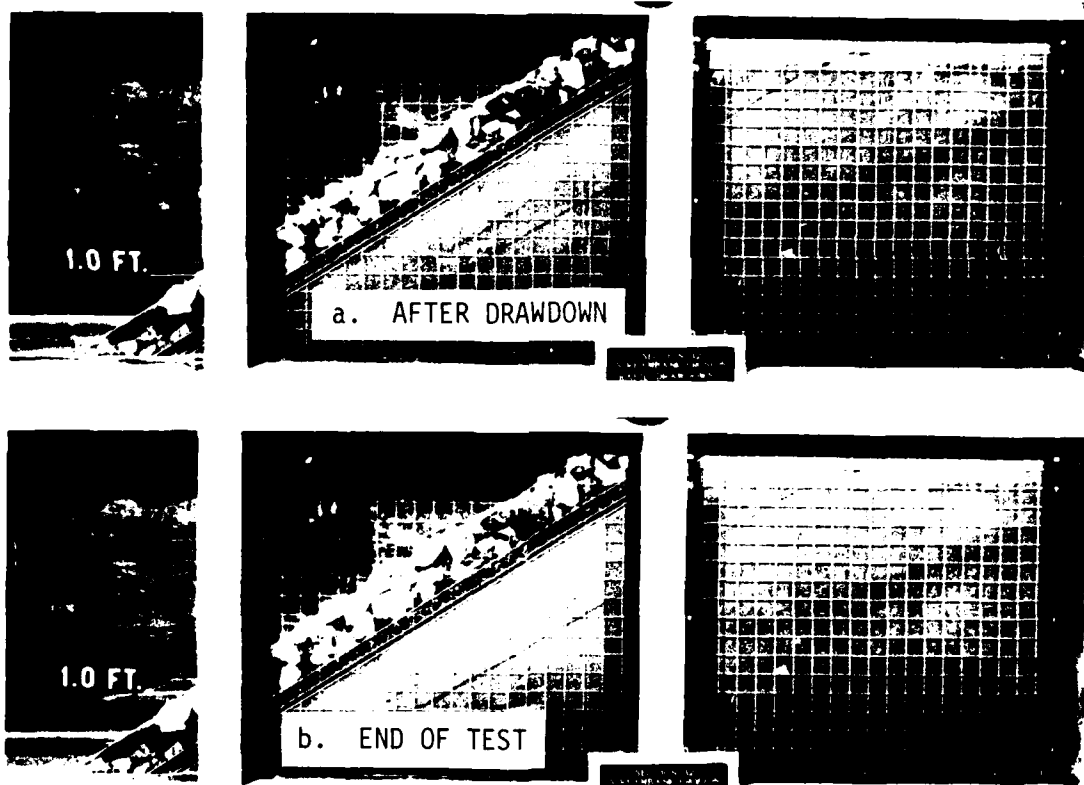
Plan 3, after drawdown and at end of the 2.0-ft/hr drawdown test
